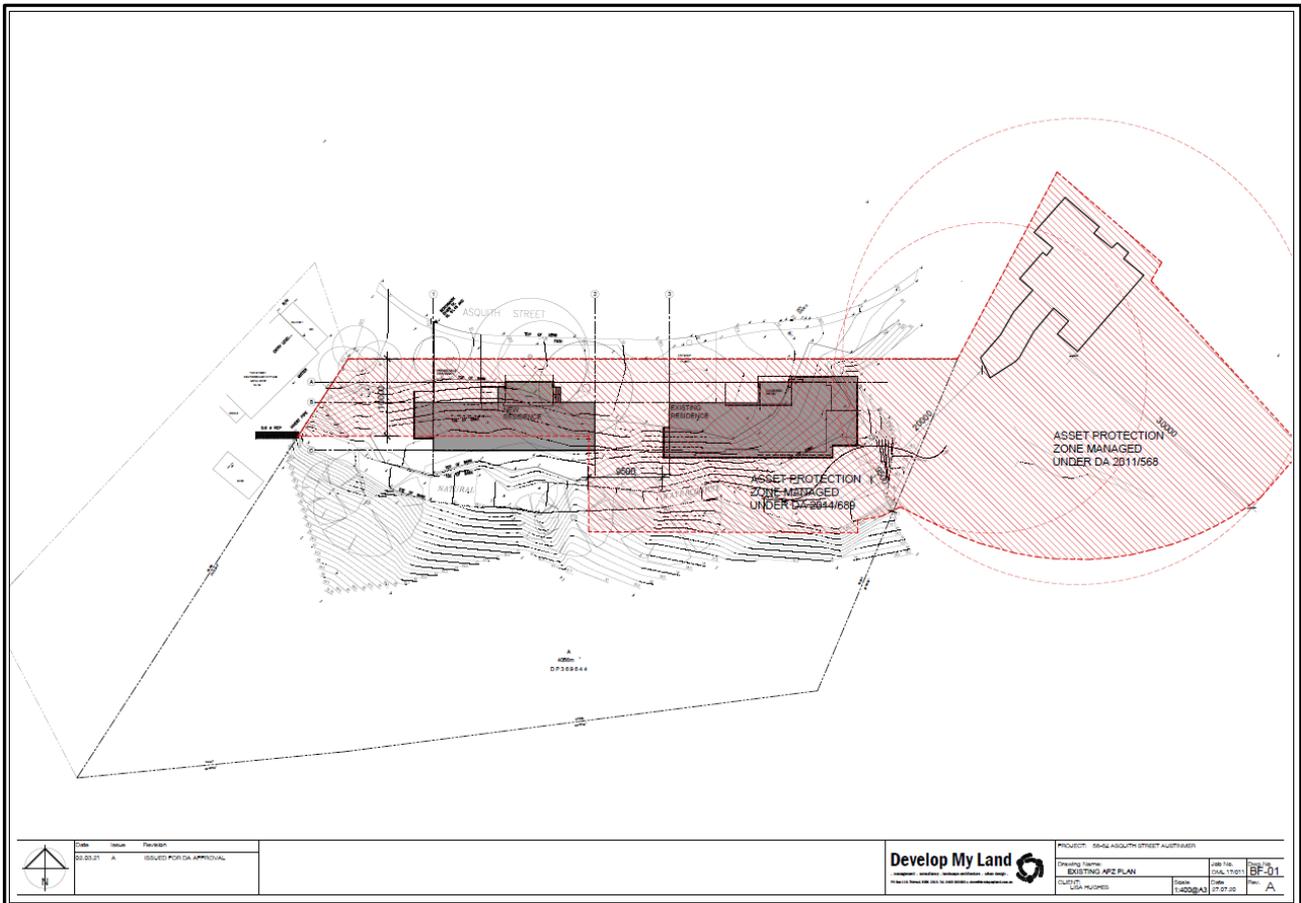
Plan showing existing DA conditioned APZs within 66 & 56-64 Asquith Street Austinmer
